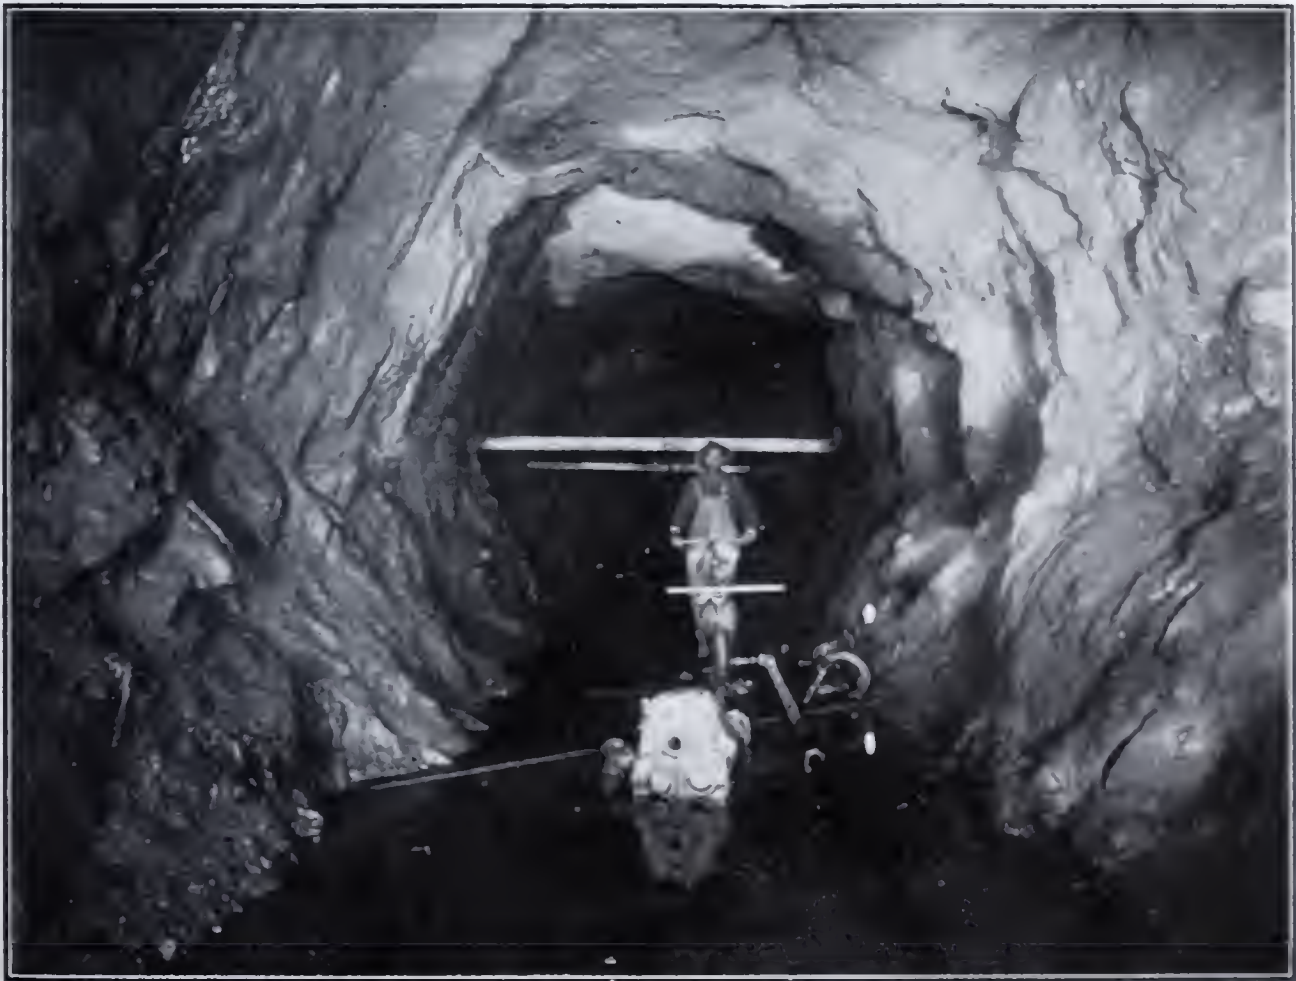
PLATE VIII.—EXCAVATION IN HARD ROCK, SOUTH HEADING, SHAFT NO. 1.
